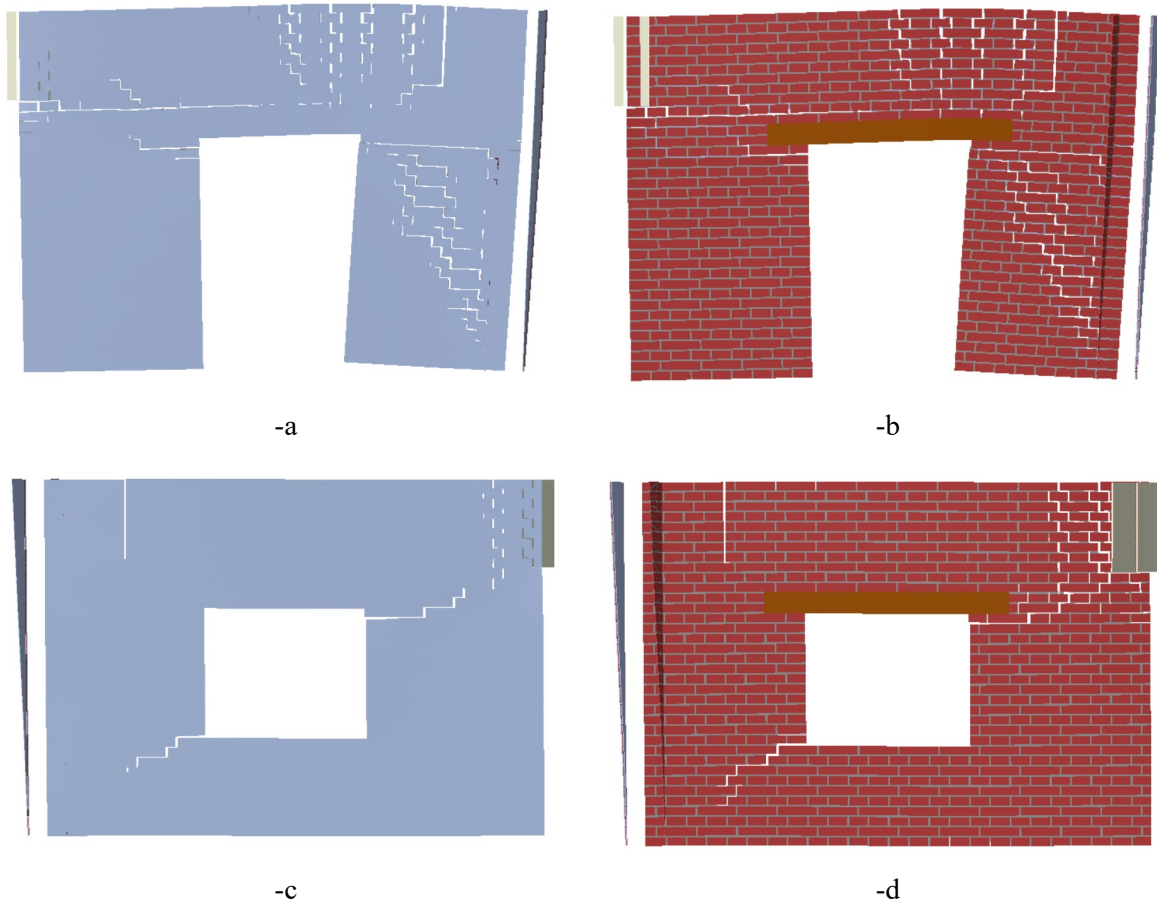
Damages observed at the peak of the FE analysis on the TRM reinforced structure, considering door's wall external (-a) and internal (-b) view, and the windowed wall internal (-c) and external (-d) view
